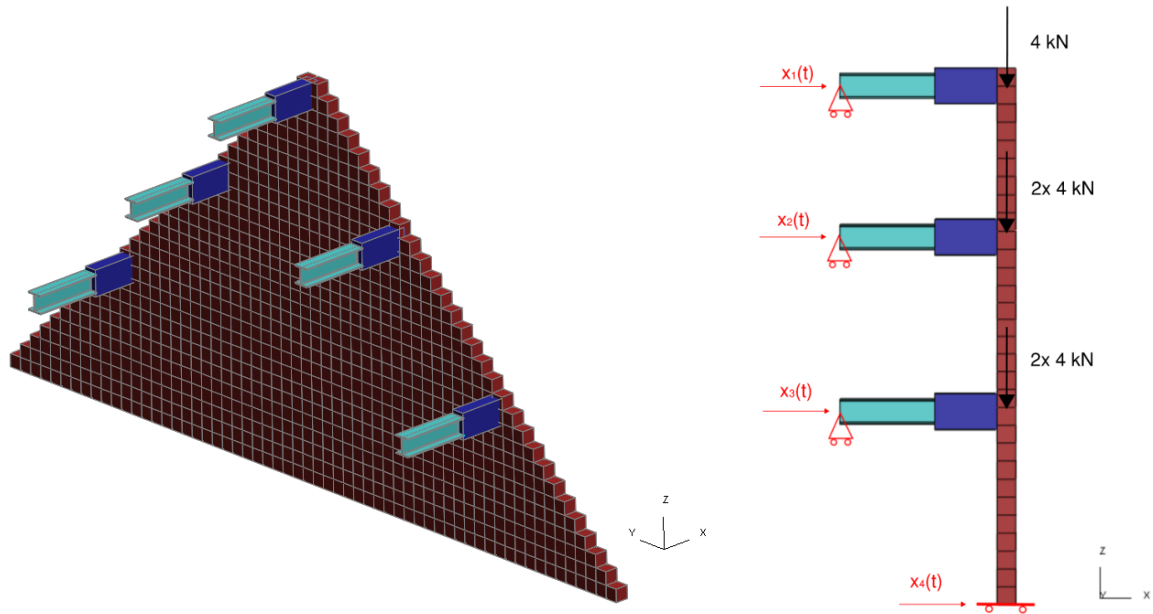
LS-DYNA model, loads and boundaries, with element cross-sections flashed out.
